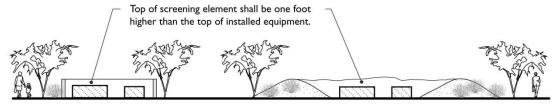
A.2: SCREENING OF GROUND-MOUNTED EQUIPMENT
